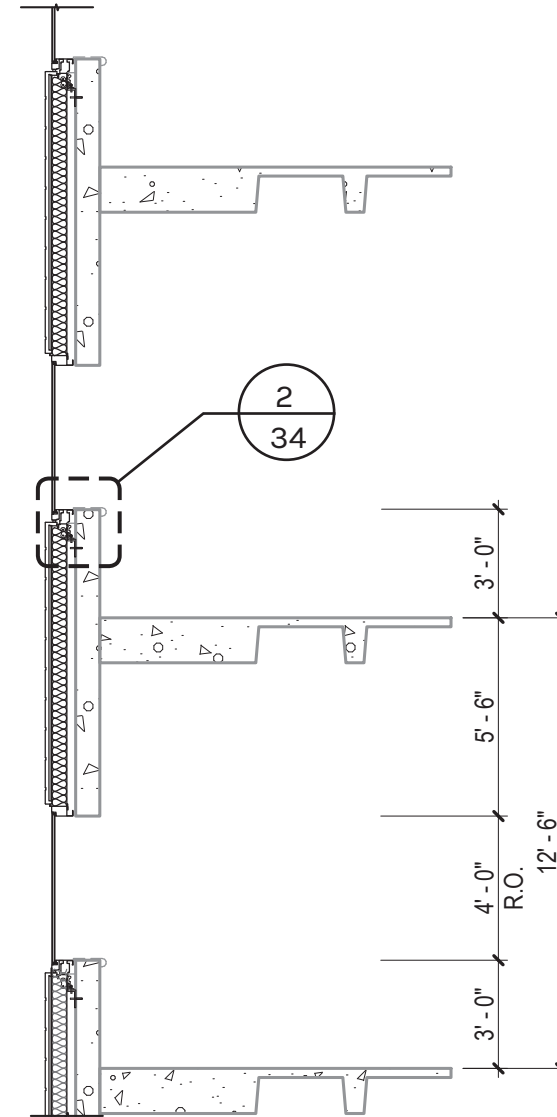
DETAIL VIEW AT PROPOSED INTERSECTION OF TOWER AND GLAZED CURTAINWALL
